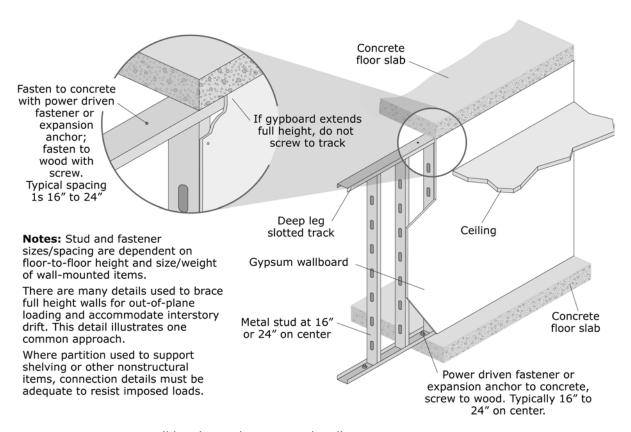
Full height nonbearing stud wall (ER).
